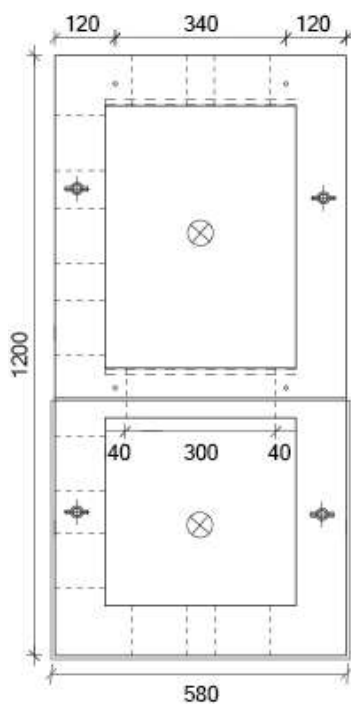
Indicative drawing for double cabinet's concrete foundation, top view (mm)
